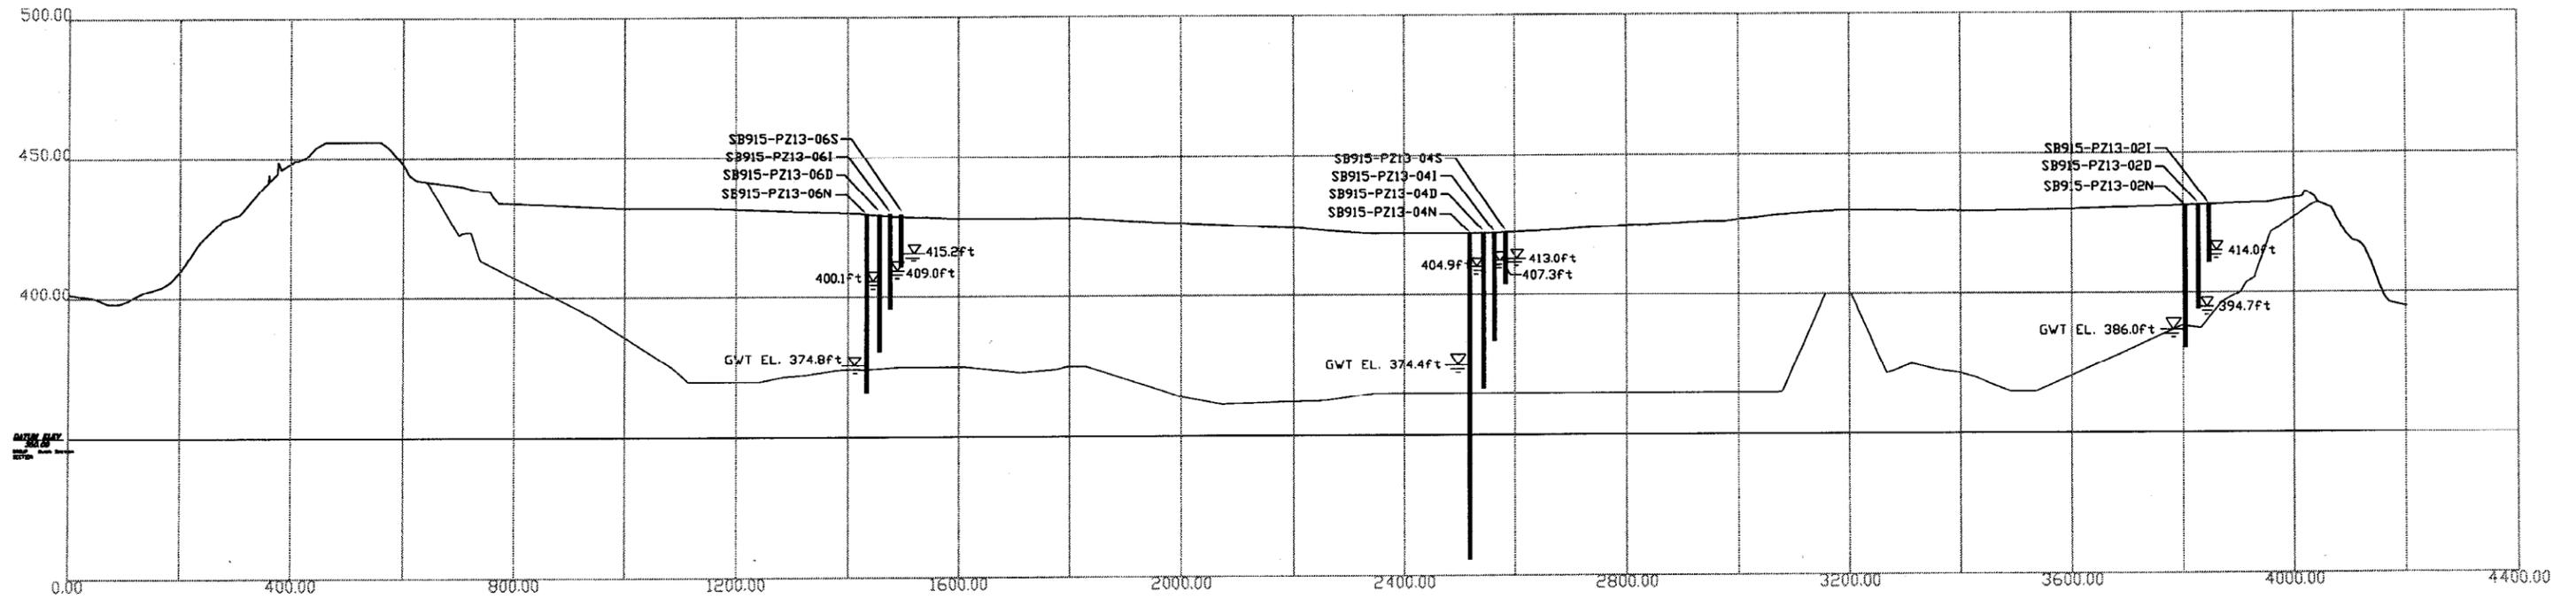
Measured Groundwater Table Elevations on Cross Section 1
